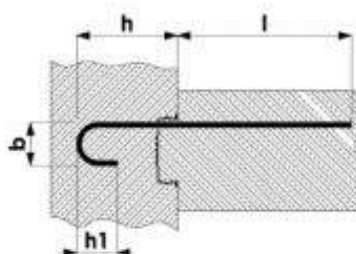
ExBox reinforcement bars connecting set for connecting reinforced concrete components
